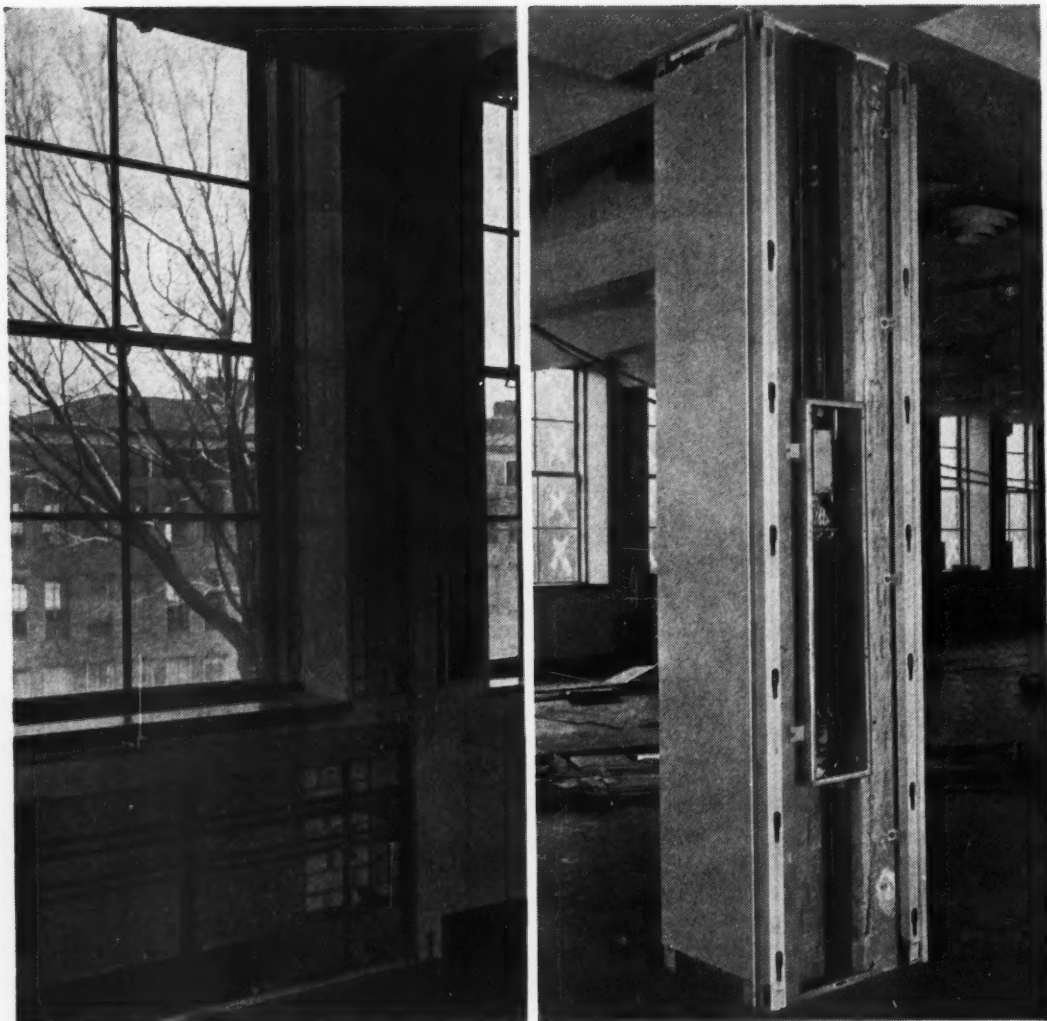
Left, steel wainscotting on outer walls showing horizontal runs of piping beneath windows, the wire-way, and the door to give access to circuit breaker or telephone wiring. At right, single wall wainscotting around central column
